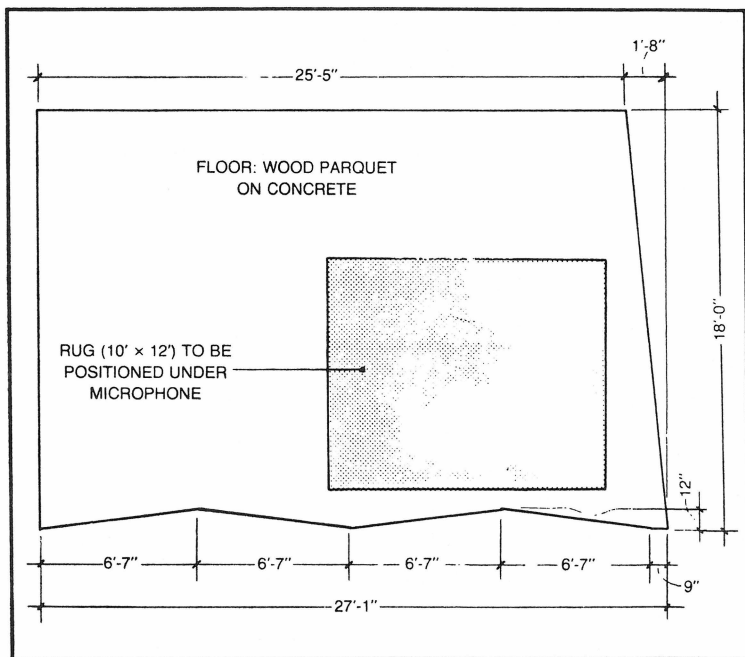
Splaying plan of studio. The splaying angles are about 5 degrees (east wall) and 8.6 degrees for the triangular south wall.
